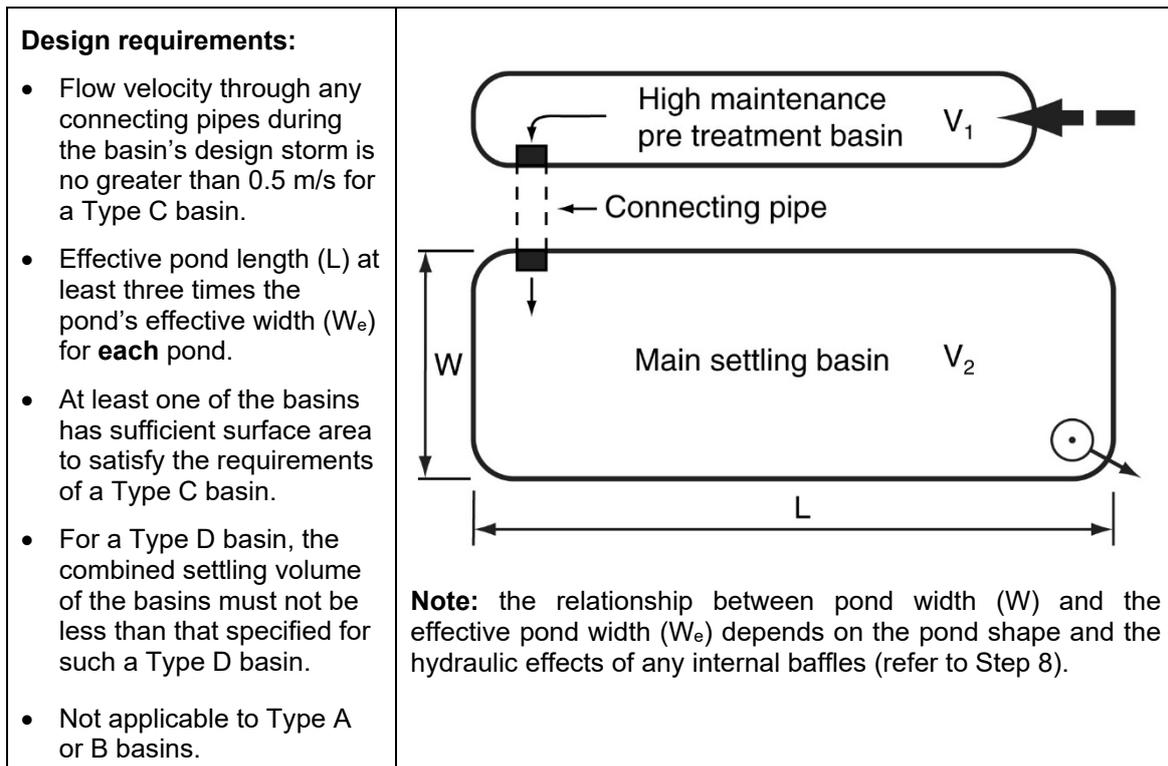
Multiple sediment basins with single connecting pipe/culvert
